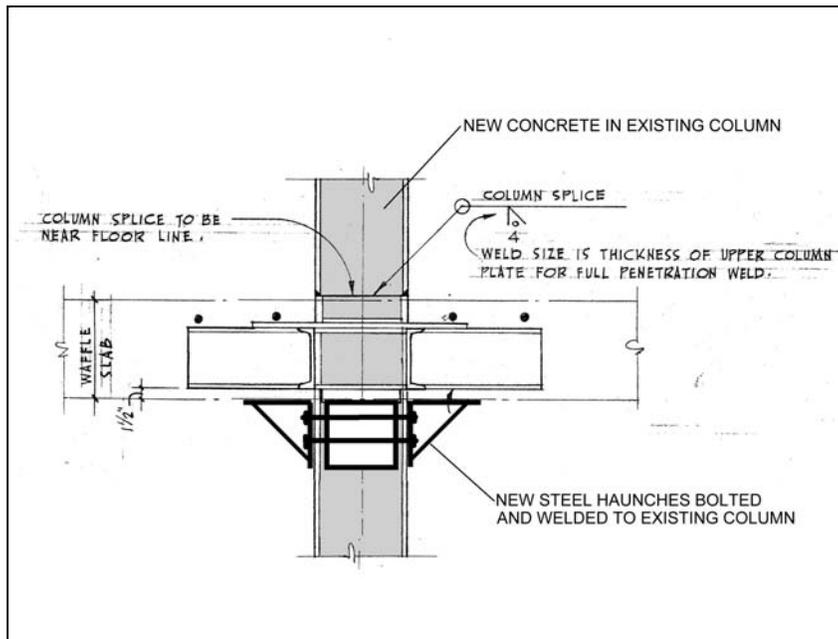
Reinforcement of Existing Columns and Floor to Column Connection.
